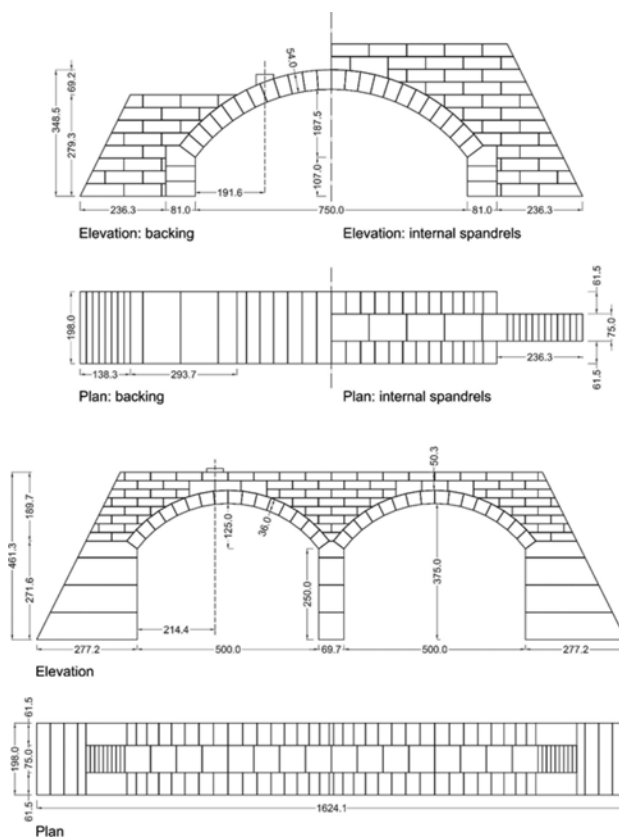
Main dimensions of single and multi-span bridge models tested, with backing and internal spandrel masonry shown (all dimensions in mm).
